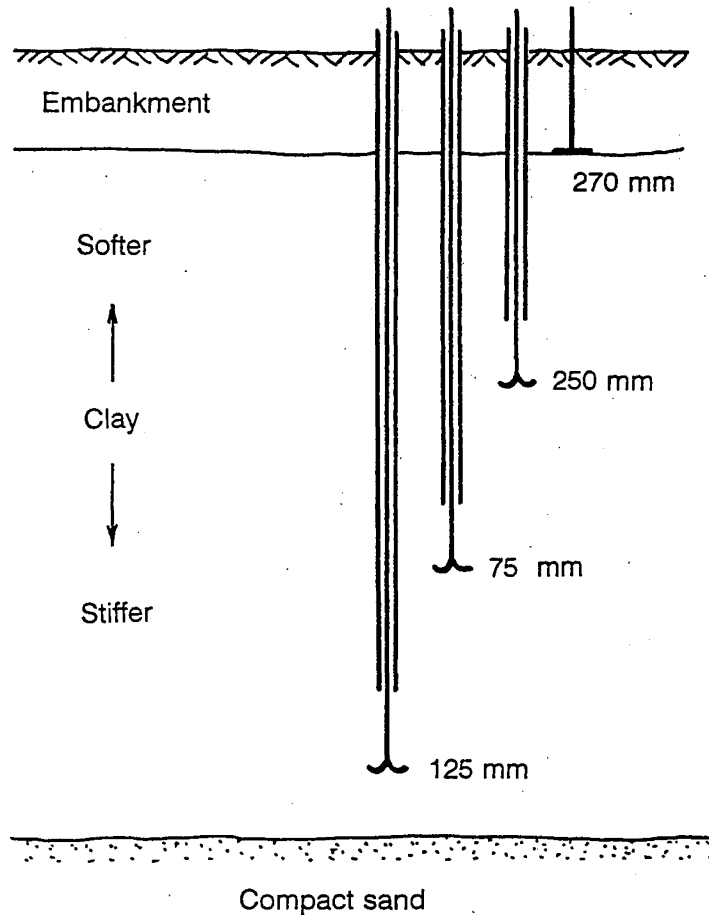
Embankment on Soft Ground, With Borros Anchors
